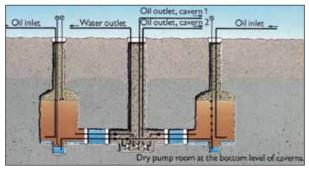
Underground pump room. Dry pump rooms were built in the 70's when submerged pumps did not have enough capacity. (Illustration: Neste Oy)
